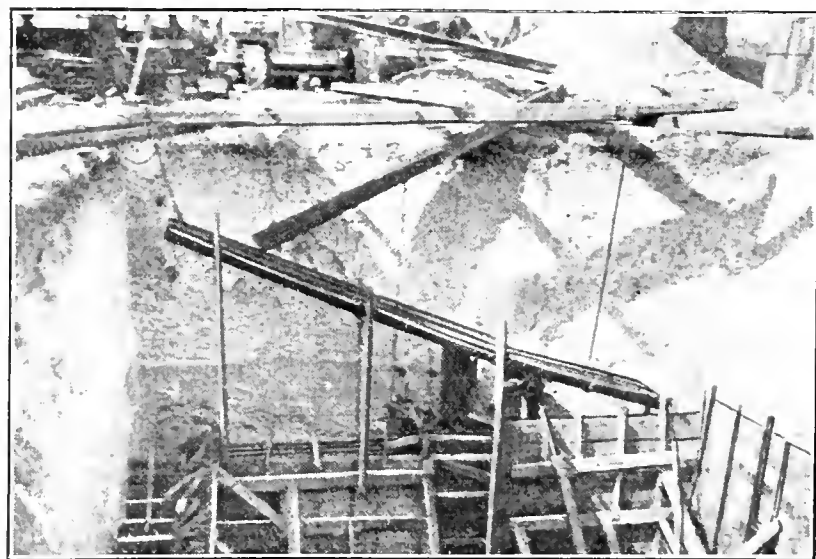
CORRUGATED IRON SHEETS FORM INCLINED CHUTES FOR LINING GUN-SHRINKING PIT
